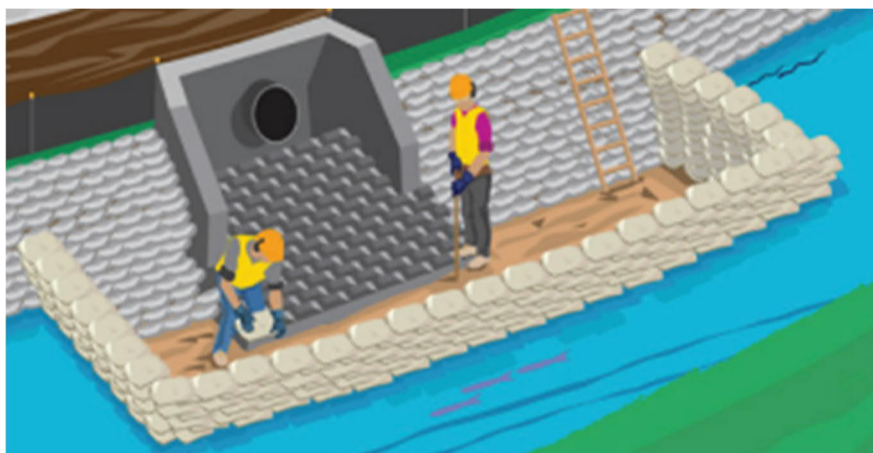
Image of typical coffer dam construction for work undertaken at the edge of the lake
